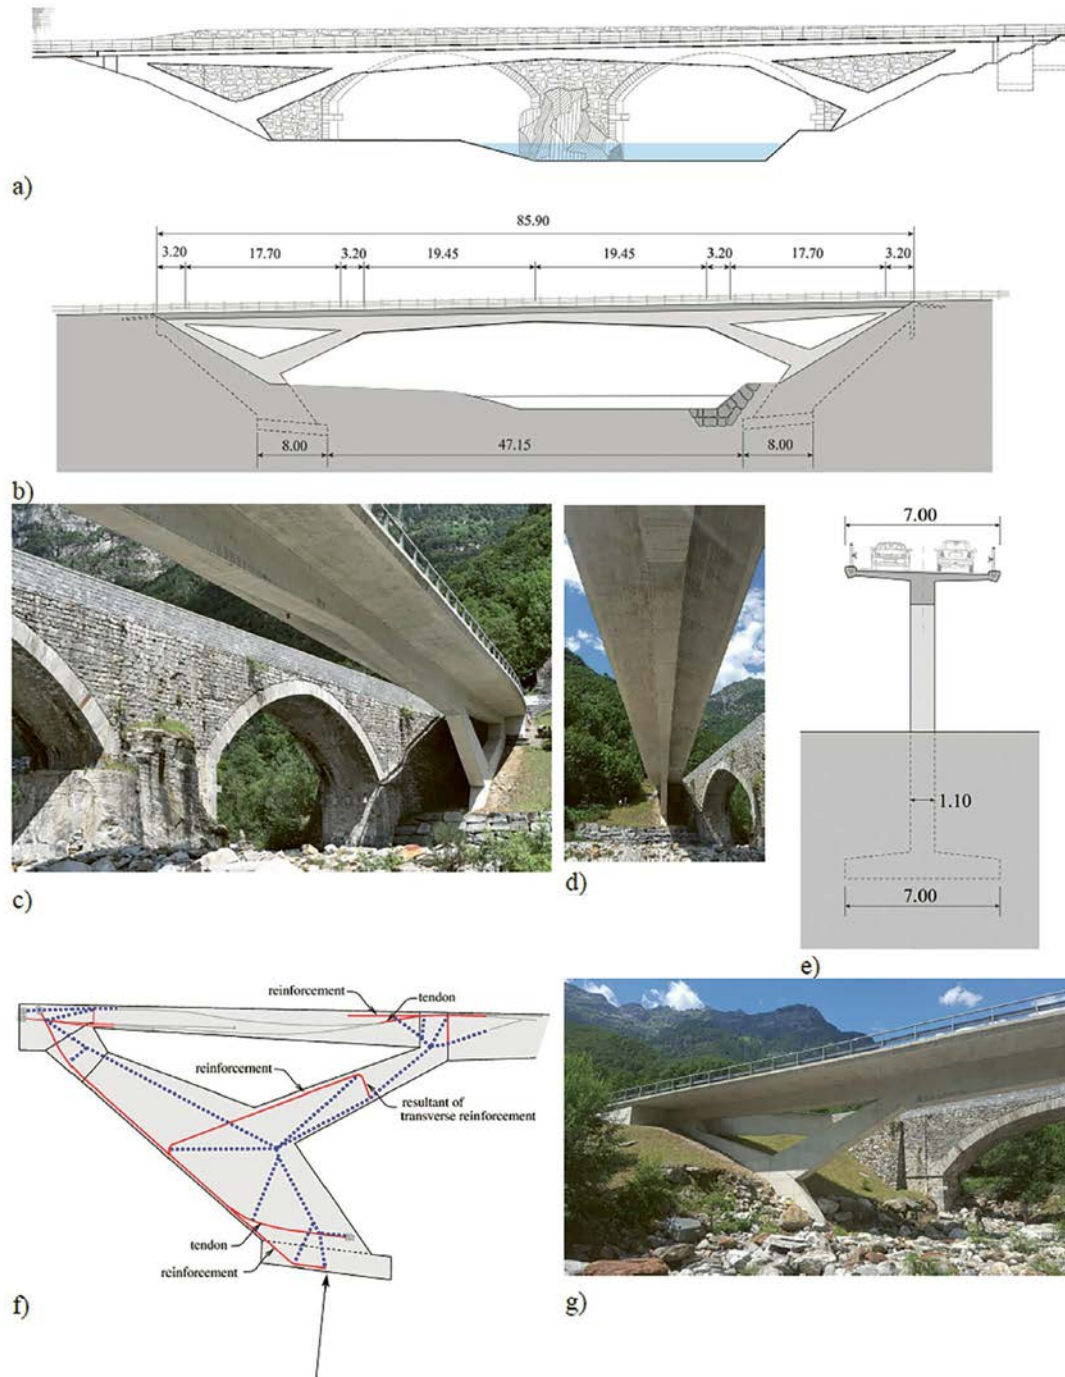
Verzasca Bridge at Frasco, Switzerland; (a) elevation showing the existing masonry bridge; (b) scheme of the system; (c), (d) and (g) photos; (e) cross section; and (f) strut-and-tie model of the abutment (Lurati Muttoni Partner civil engineers, A. Muttoni structural designer, with Michele Arnaboldi architect) [17].
